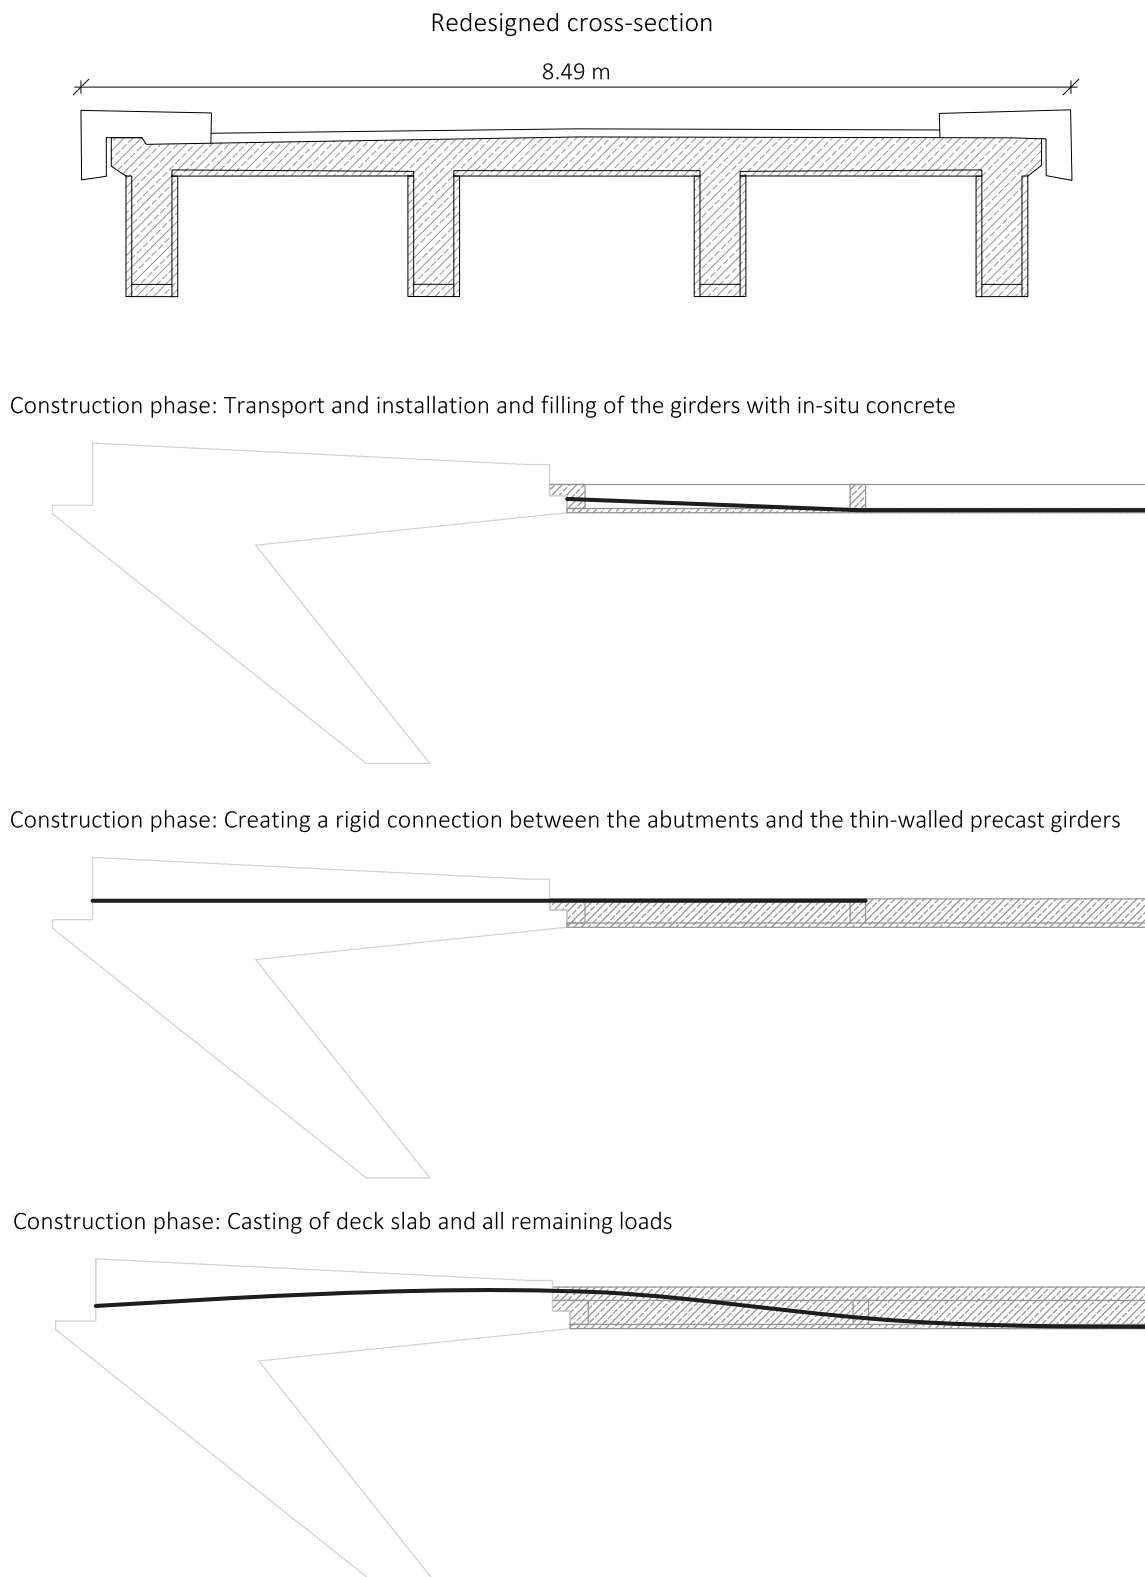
Proposed cross-sections and tendon elevation in each construction phase for the redesign of the existing S103 Overpass
